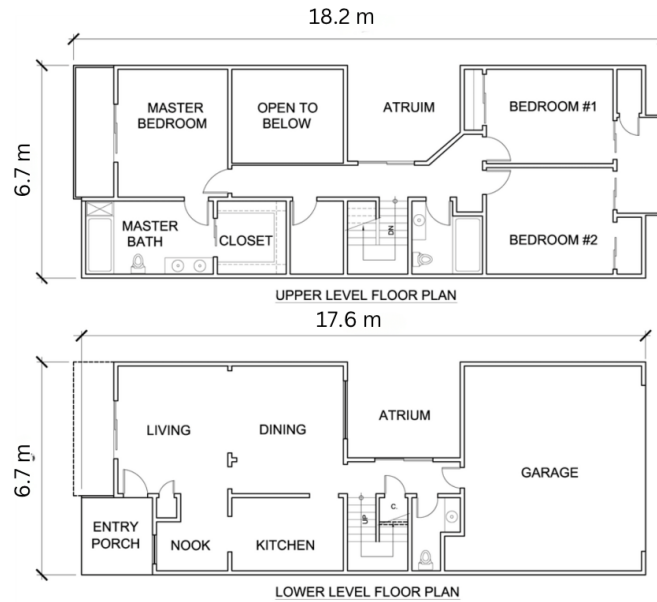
Floor plan layout of the NEESWood project building (Christovasilis et al., n.d., 2009)
